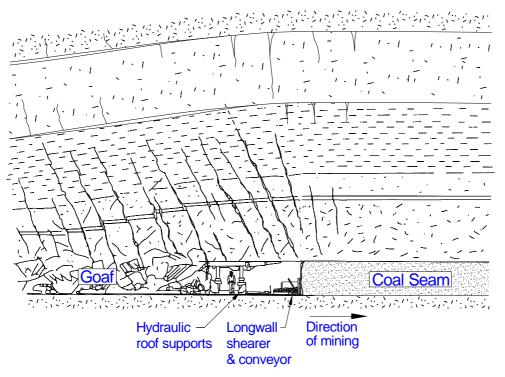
Cross-section along the Length of a Typical Longwall at the Coal Face
